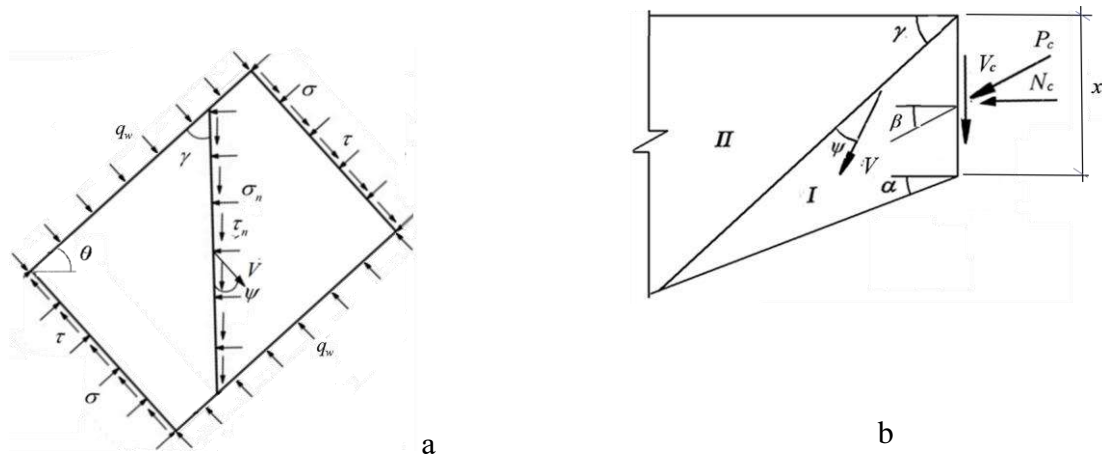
Design scheme of an inclined reinforced (compressed) strut (plate), loaded at the ends by normal and tangential surface forces (a) and a wedge-shaped concrete zone above a dangerous inclined crack (b)
